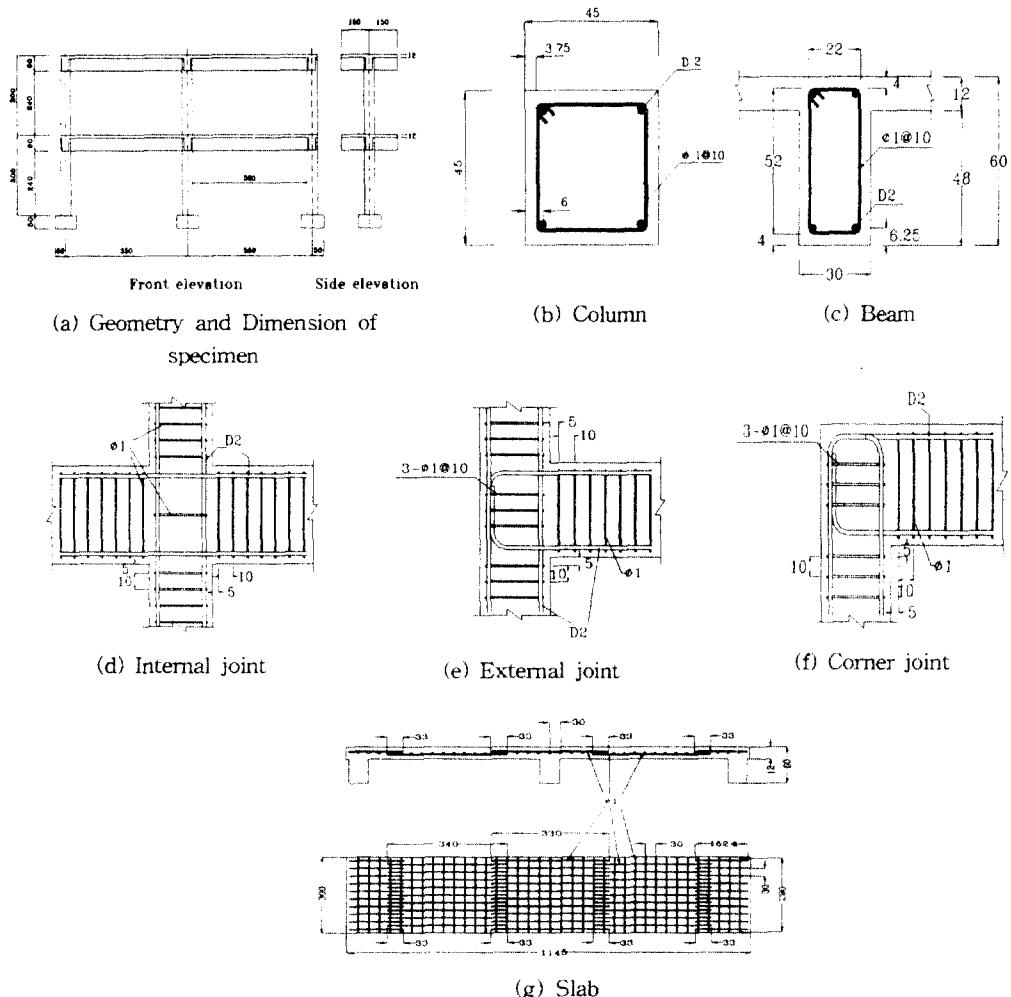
Geometry, Dimension and Detail of 1/10 Frame Specimen (unit : mm)
